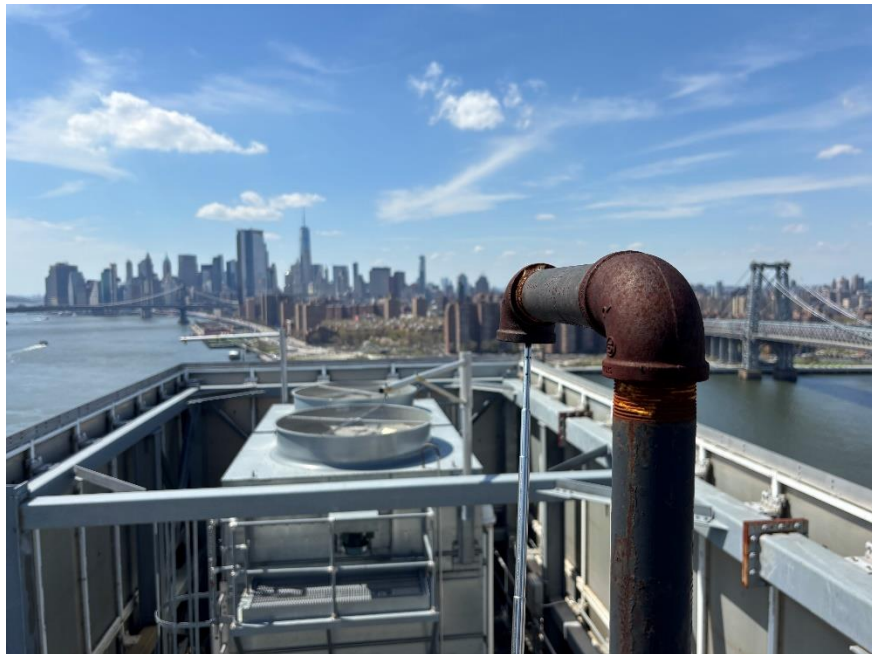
View of blower box on the building roof (04/14/2026)
